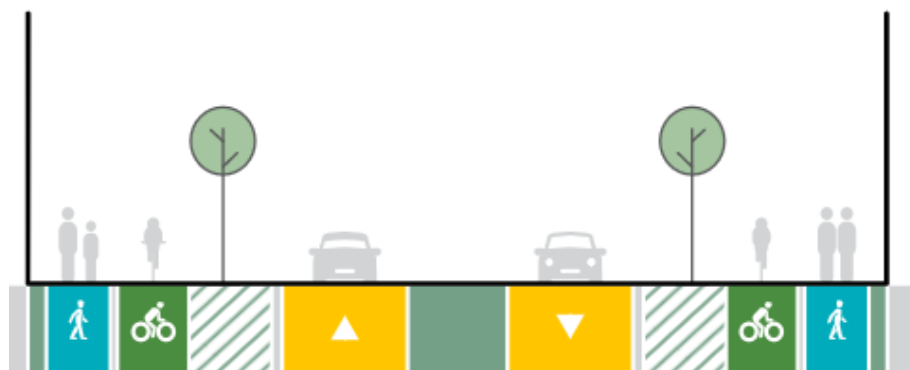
CFAF Outcome – Spedding Road West Indicative 24m cross section
